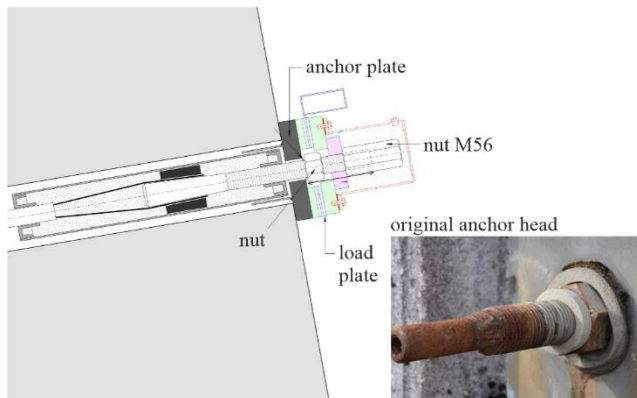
Example of retrofitting an anchor load plate for tensile elements or anchor heads with threaded component.
